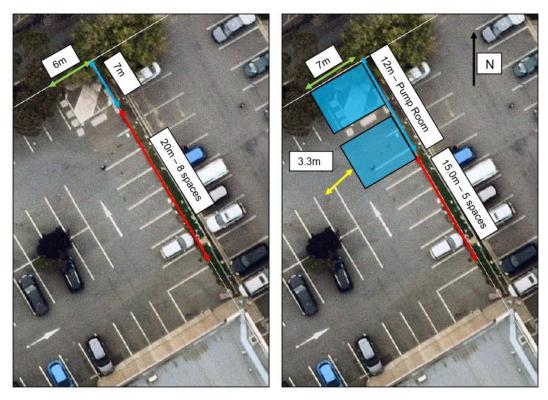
EXISTING AND PROPOSED PARKING LAYOUT COMPARISON
